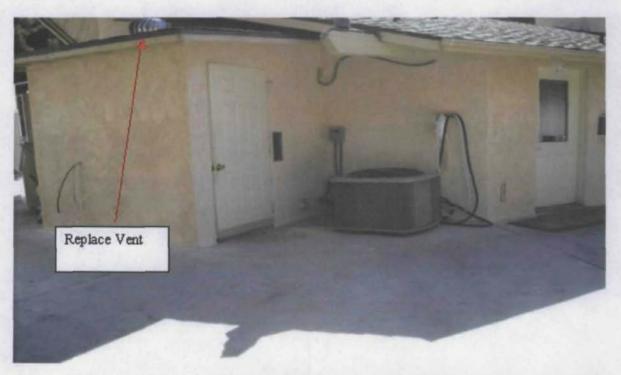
Wood Siding & Window Replaced with Stucco Backside on Office Building
